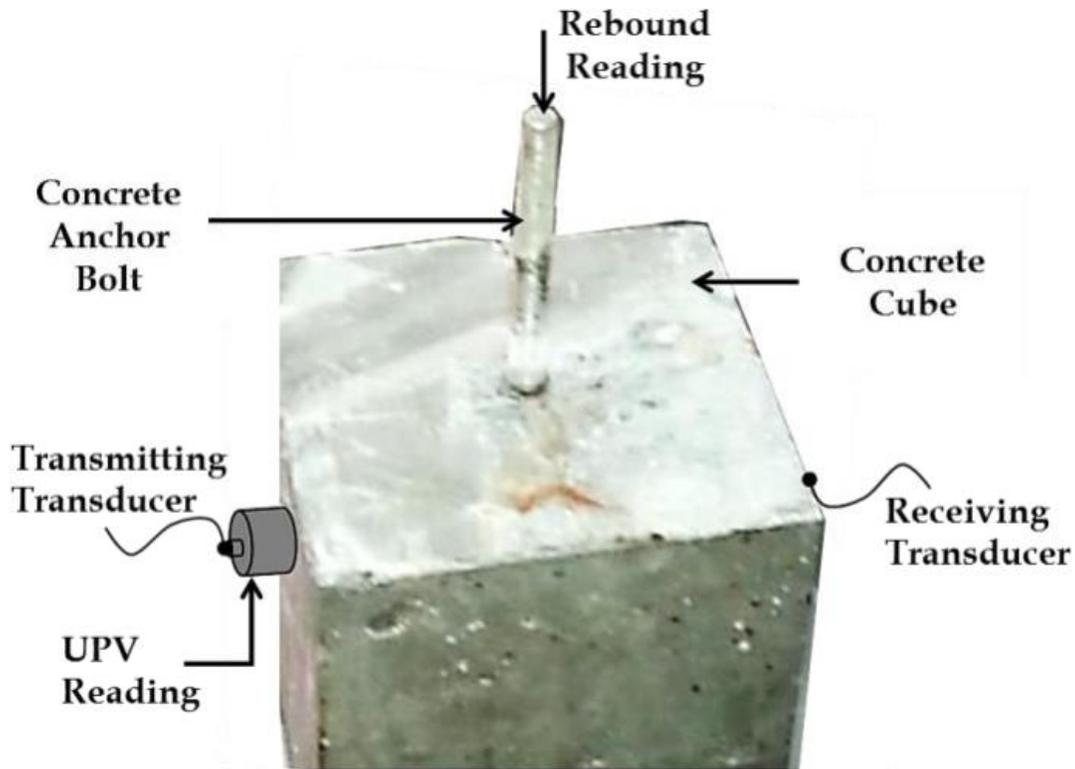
Cube-shaped specimen illustrating Schmidt hammer and UPV testing [36].
